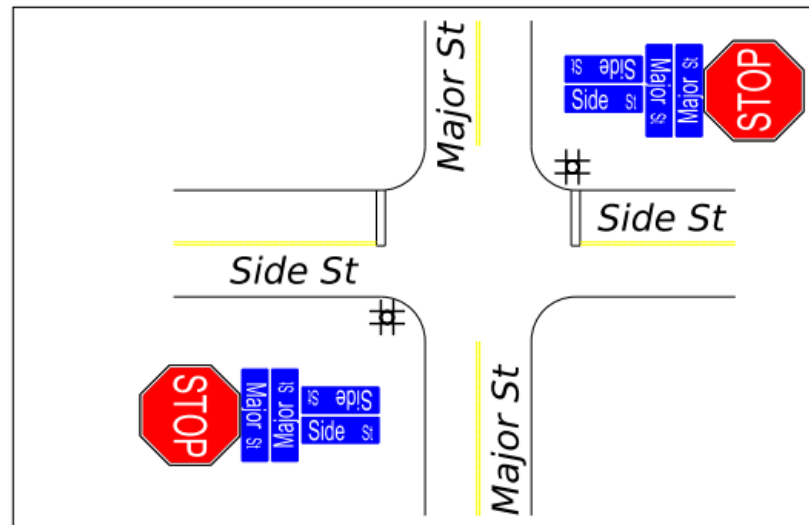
Sign Layout for Stopped Controlled Intersection Example #3
